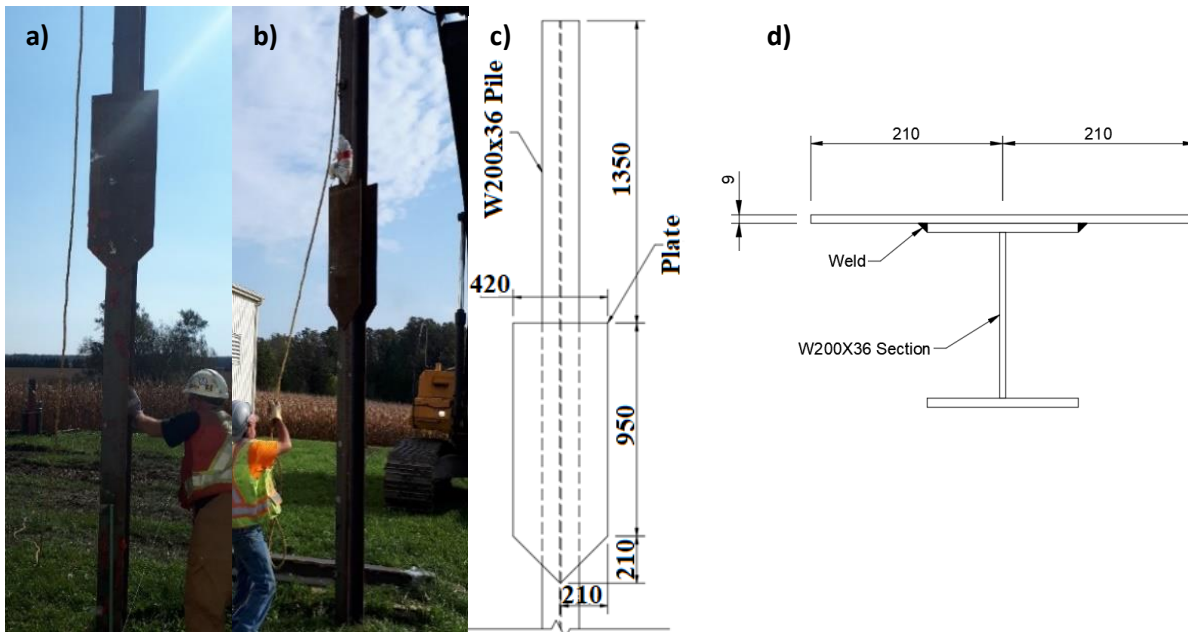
a) Single plate pile, b) double plate pile, c) dimensions of tested modified H-Pile, d) cross-section of tested pile at plate location (from Mroz, 2019)
